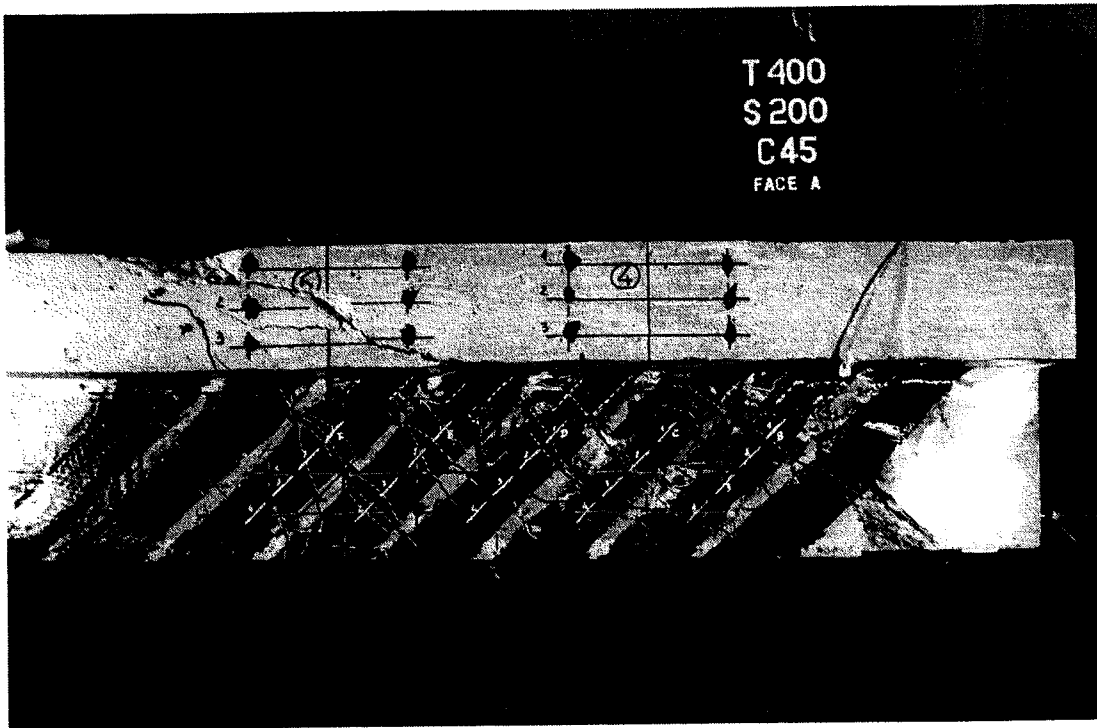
T4S2C45 Specimen after Failure (Face A)
